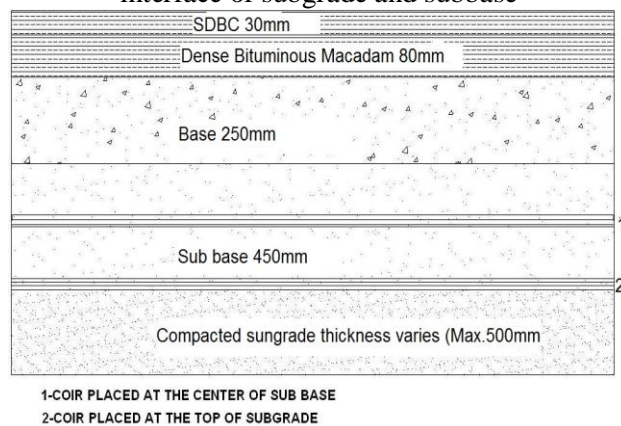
Pavement section with coir geotextiles at interface and mid-depth of subbase
